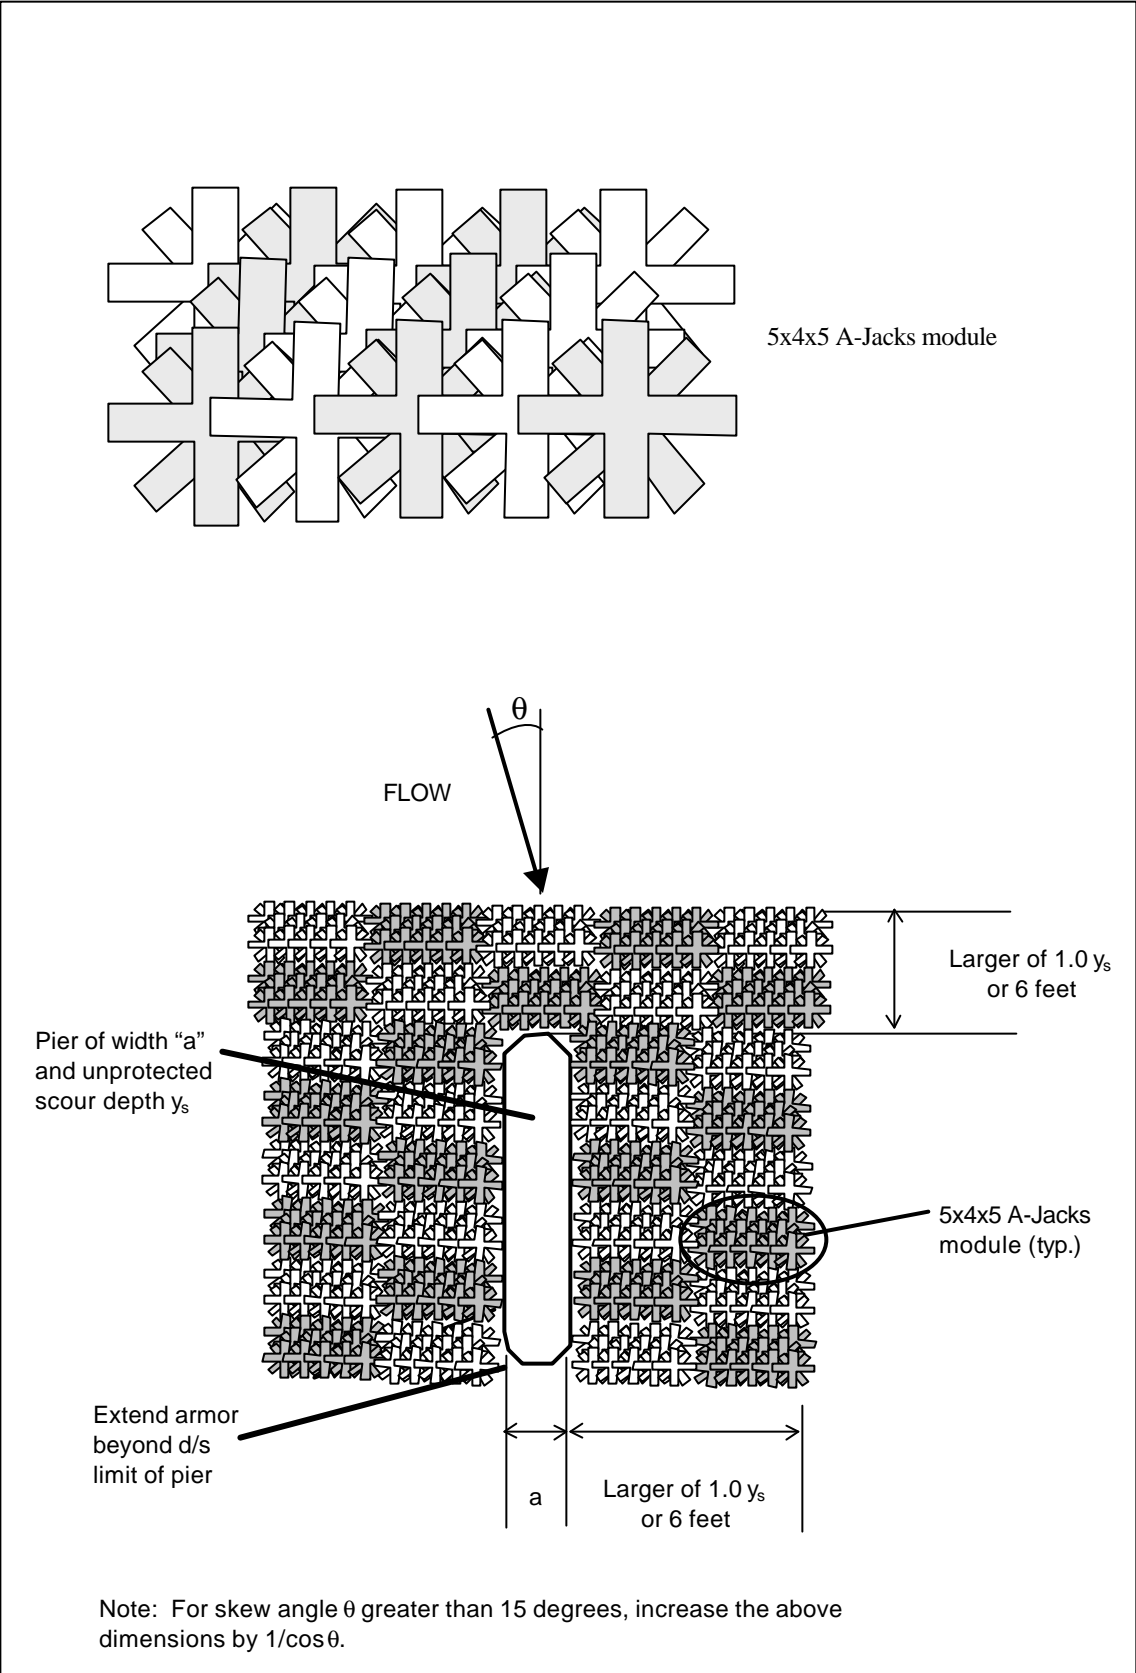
Placement of 5x4x5 A-JACKS modules for pier scour protection.
